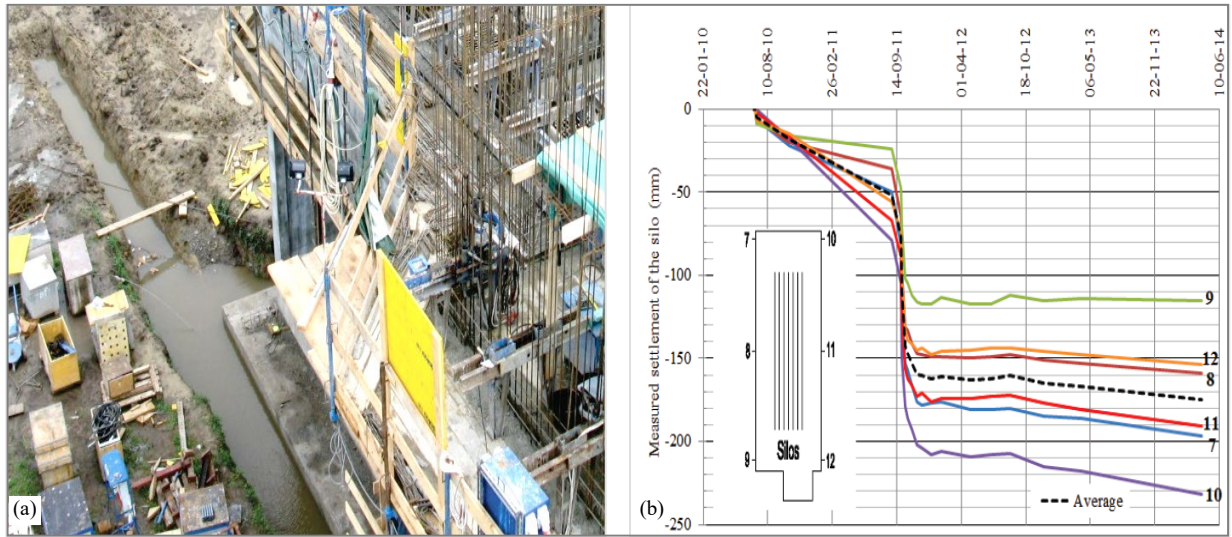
, Hydrocollapse settlement triggered by heavy rainfall: (a) A flooded foundation pit and (b) Measured differential settlement at different corners of silos (Source: Santrač et al., 2015)
